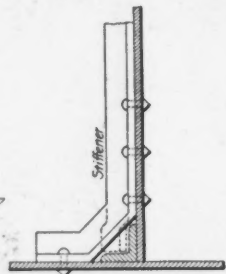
Angle Stiffener Construction for Plate Girders for South African Railways, Union Bridge Co.
